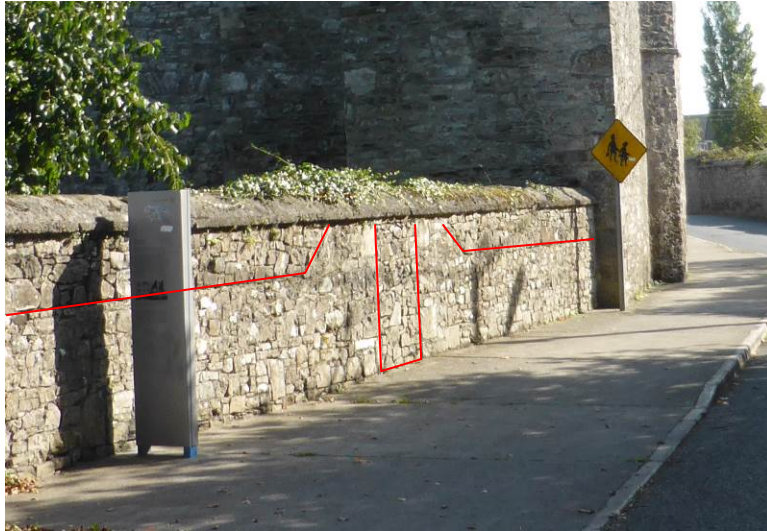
Wall abutting Athlumney Castle, showing former entrance and wall level, facing east
